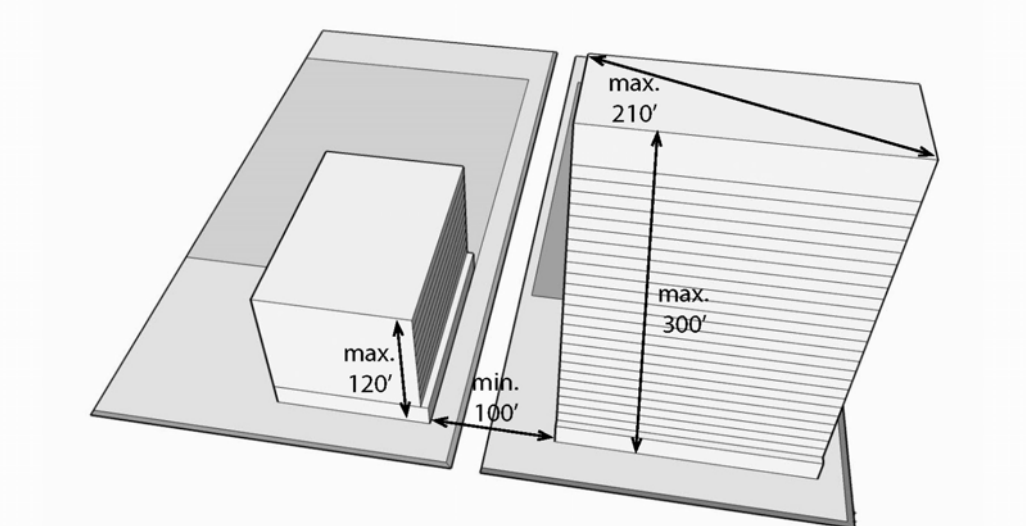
Height, Bulk and Spacing for Buildings 200' to 300' High near a Building 65' to 120' High
